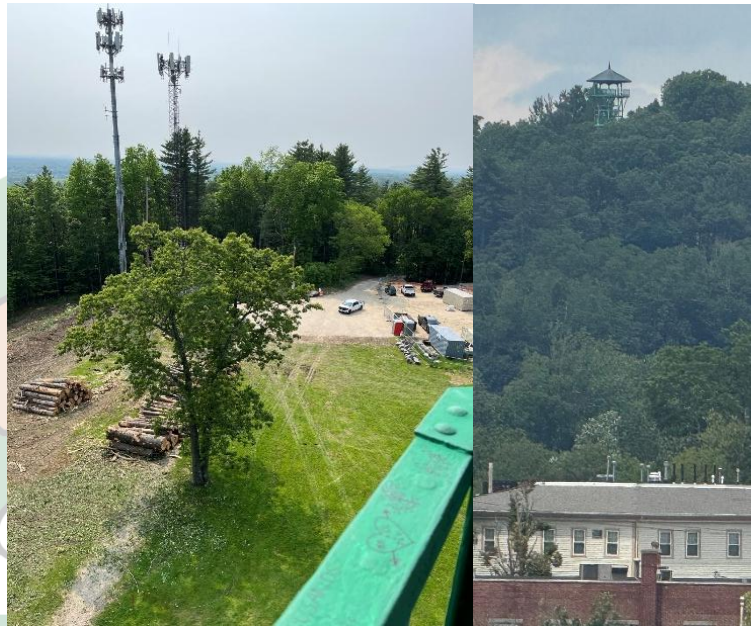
Garrison Hill Water Main Work site & Improved Tower Visibility
